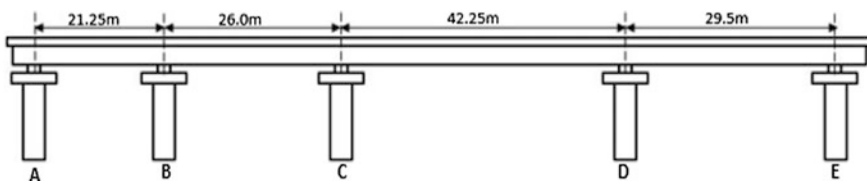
Span arrangement of four span steel-concrete composite bridge
